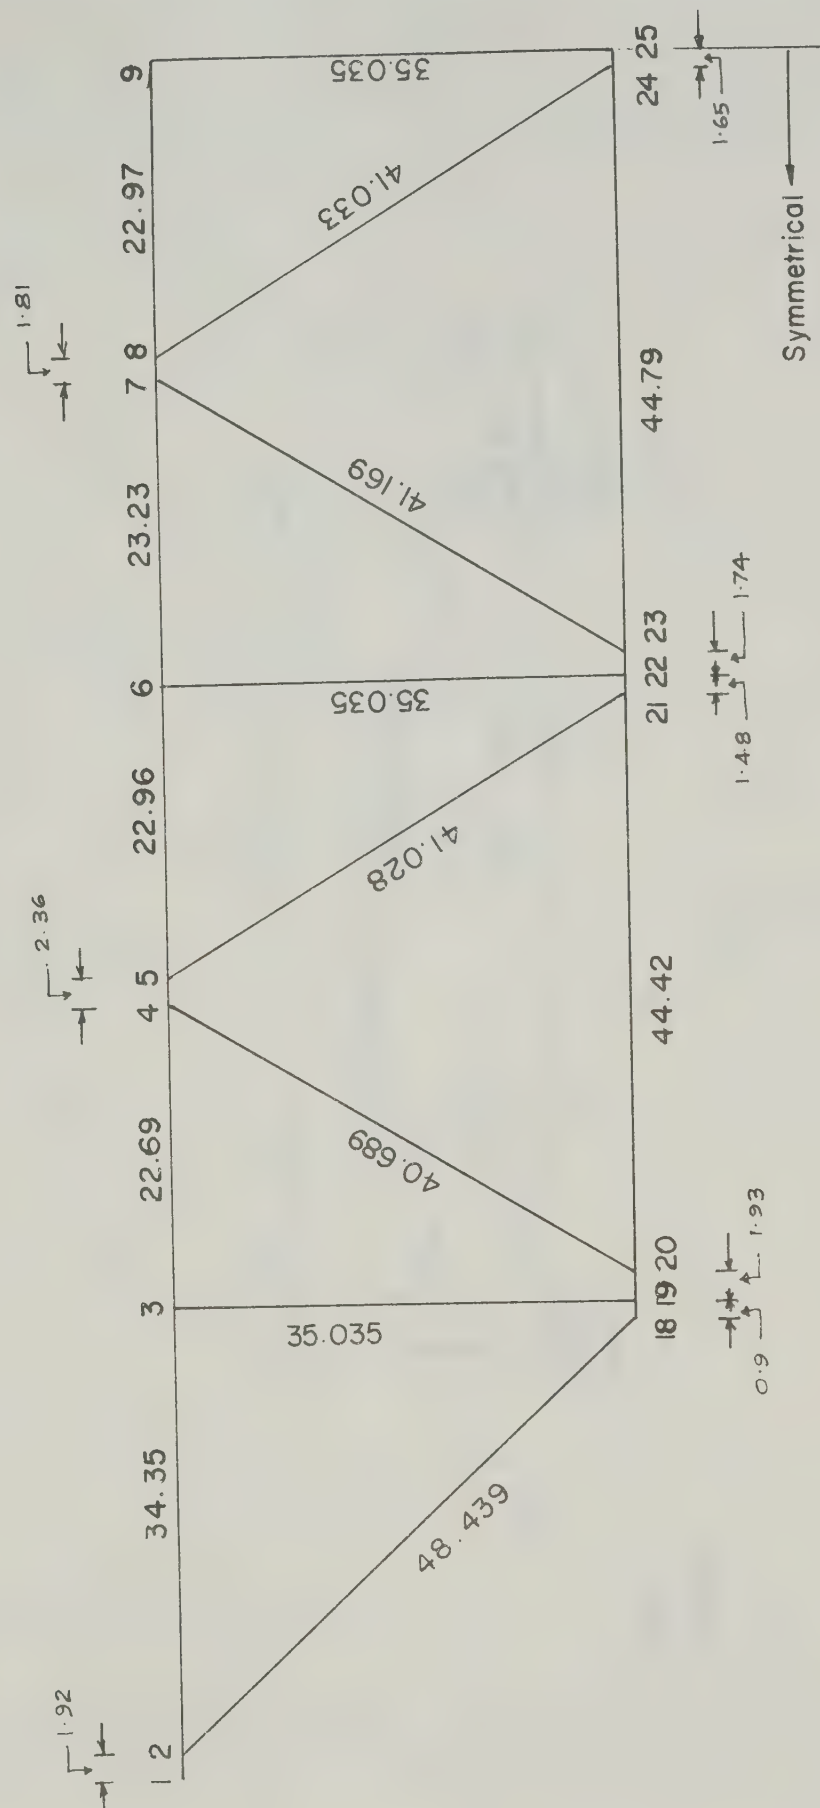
Dimensions of Test Joist AX05 (14) in inches.
